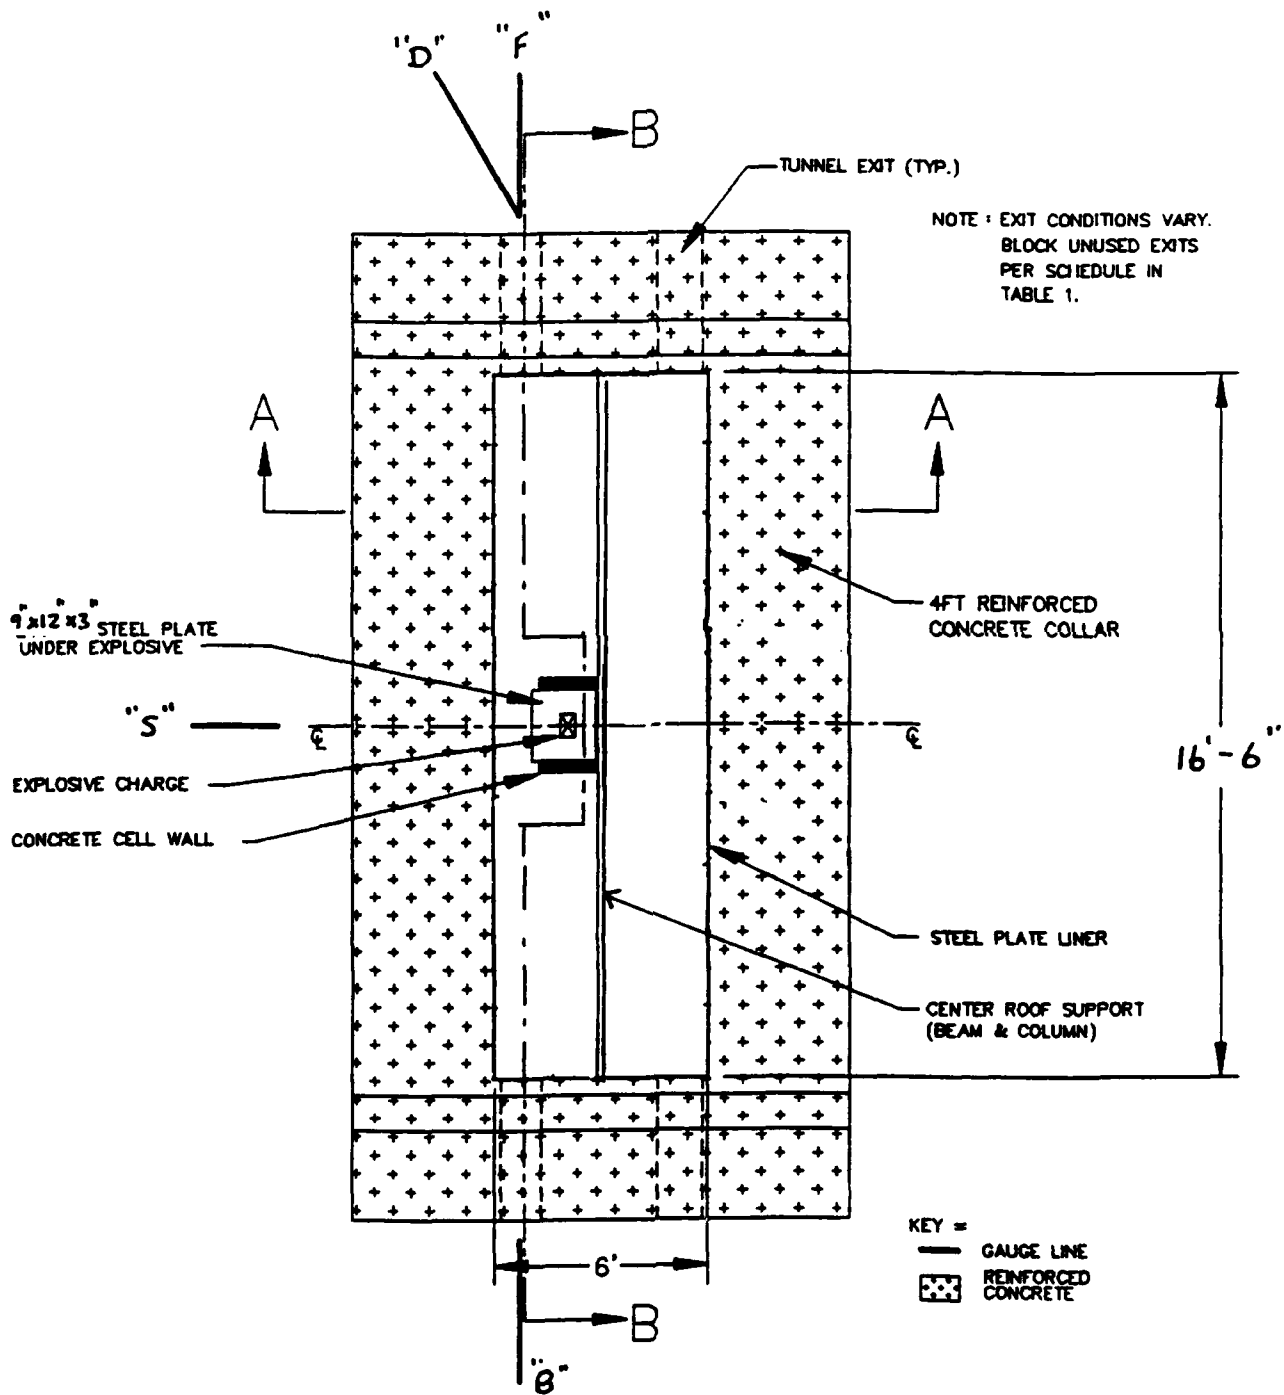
TEST FIXTURE : PLAN VIEW (ROOF NOT SHOWN)
